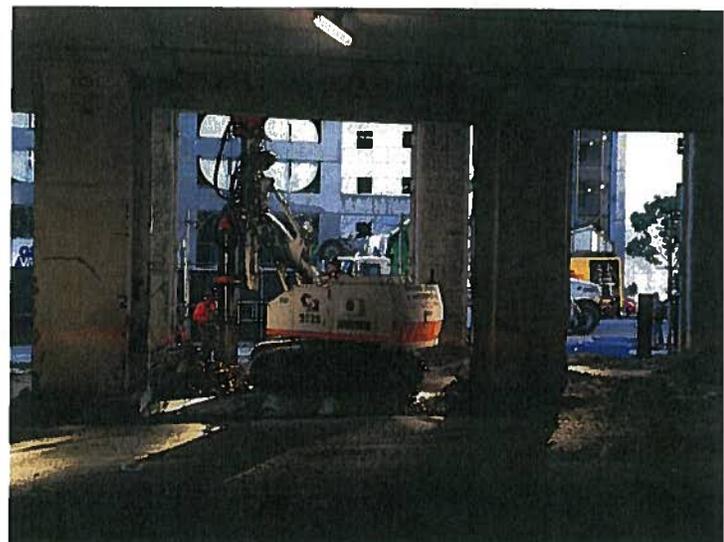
Drilling for installation of shoring system along Beale Street in preparation for foundation strengthening.
